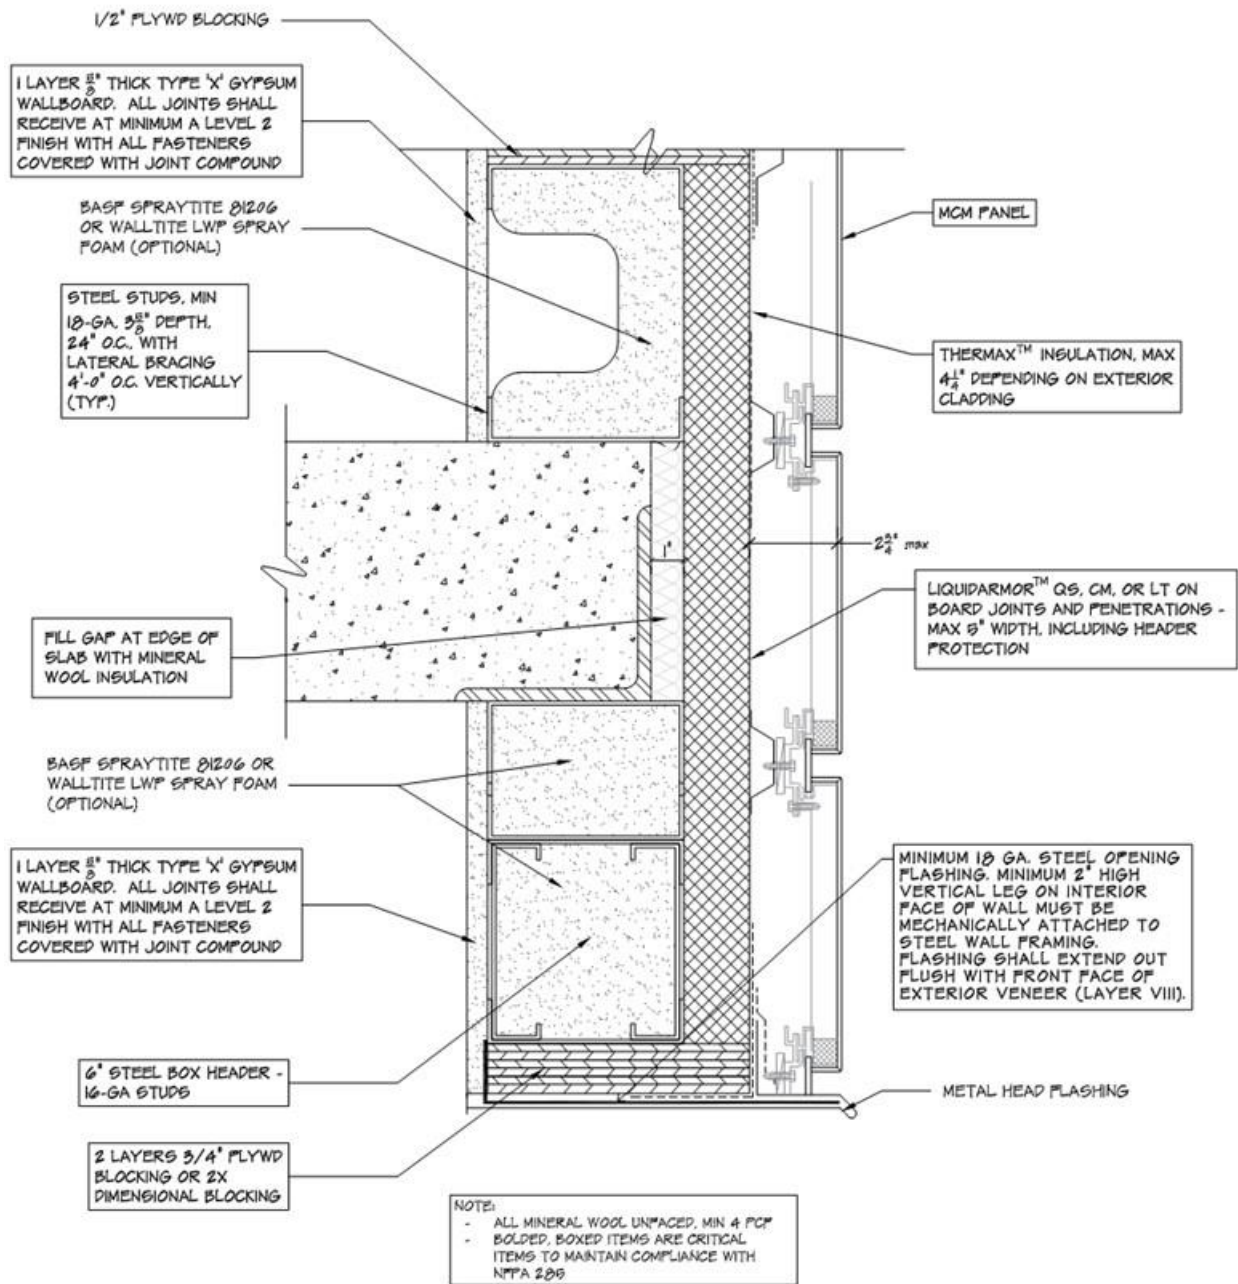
Required Opening Head Protection When BASF SPRAYTITE® 81206 or Walltite LWP Spray Foam Is Used in the Cavity (Infill Wall Construction with ACM Façade)
